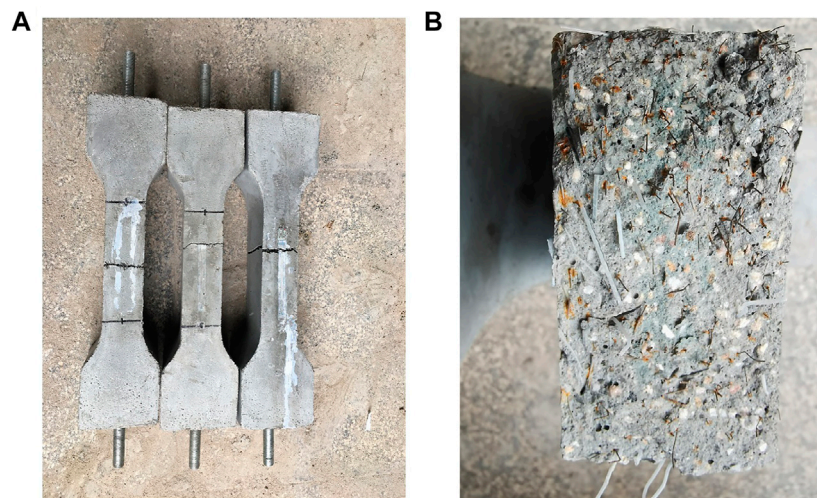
| Typical failure mode. (A) Failure mode of specimen. (B) Fracture failure state of specimens.
